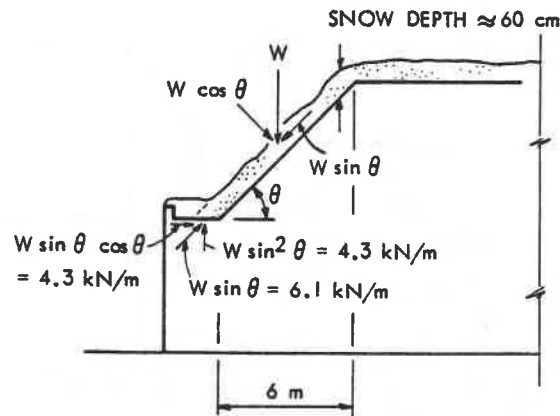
Forces applied to a flat roof and parapet by snow on a 45° metal roof (snow density = 2.4 kN/m³).
